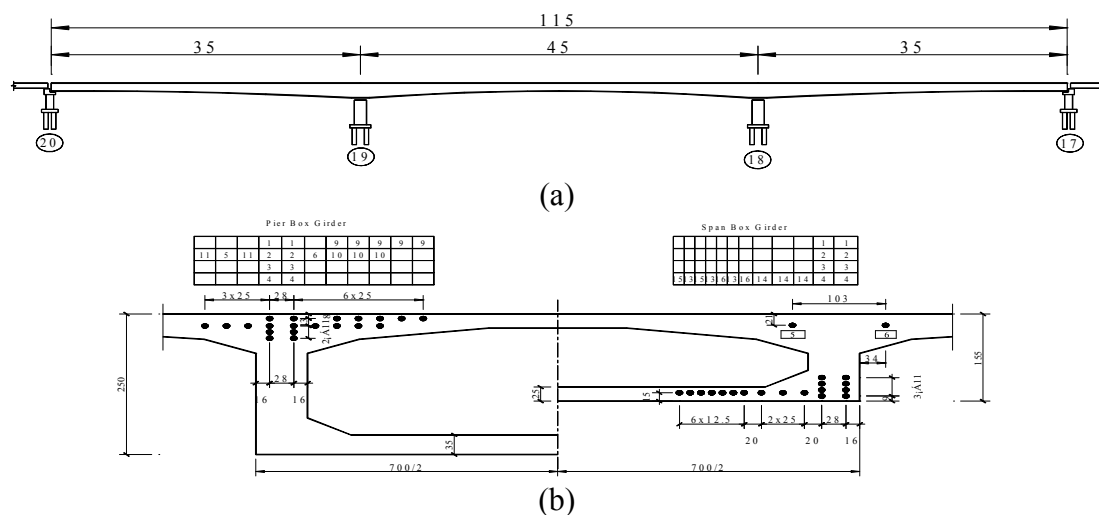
Bridge structure: (a) layout of the bridge spans, (b) transverse sections of box girder
